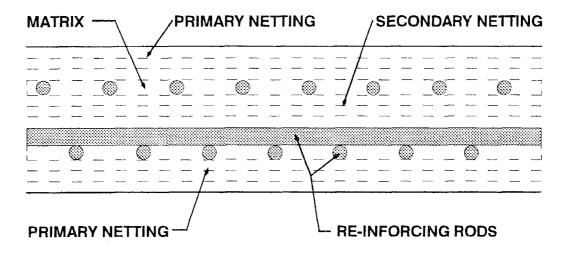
CLASSICAL FERROCEMENT CROSS SECTION
